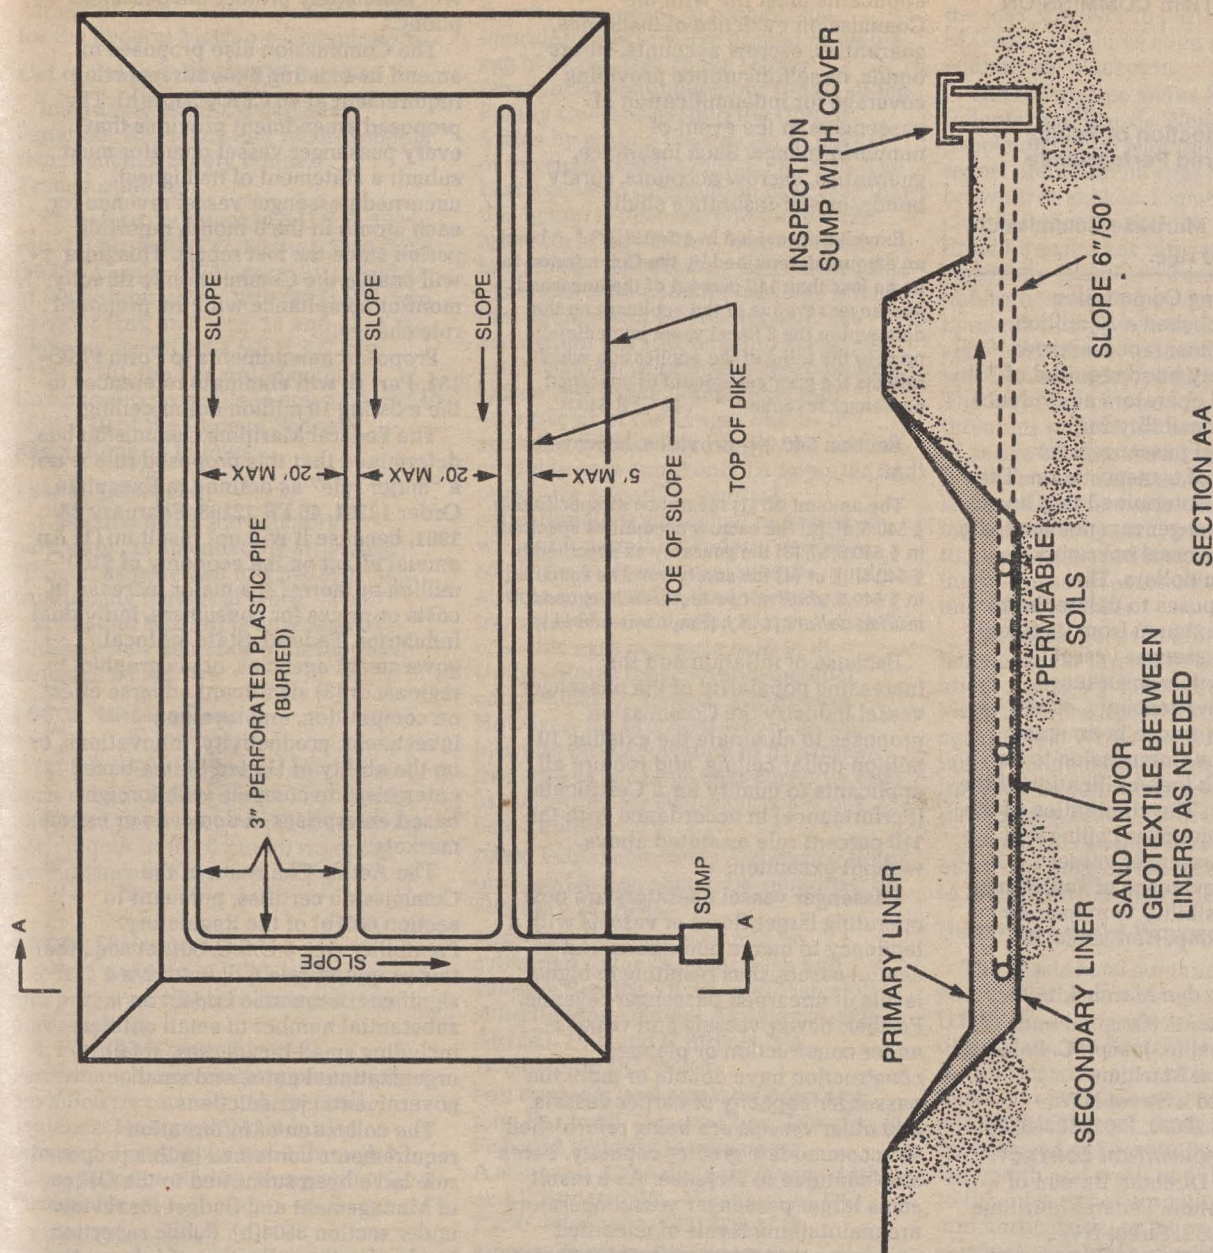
EXAMPLE OF A LEAK DETECTION SYSTEM FOR A LINED PIT CONSTRUCTED IN PERMEABLE SOILS.
